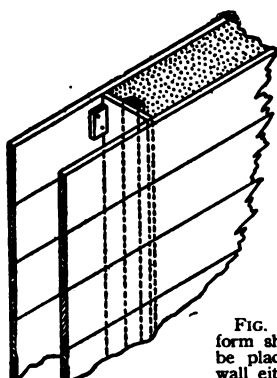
Part of simple form showing how block can be placed to mortise end of wall either for appearance or to admit a sliding division board, a door frame, or the tongue of another section of wall with which a strong joint is desired.
